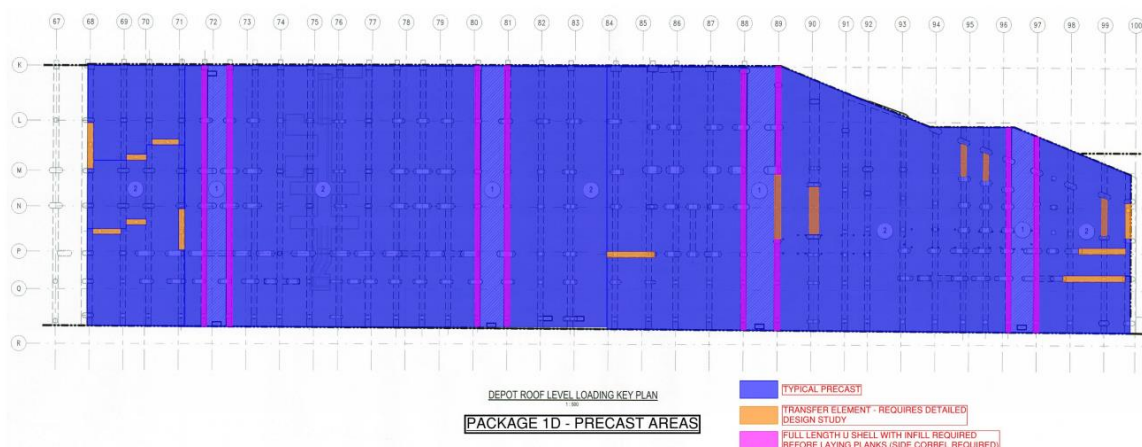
of Extent of Precast RC Beam and Slabs for OYB construction
